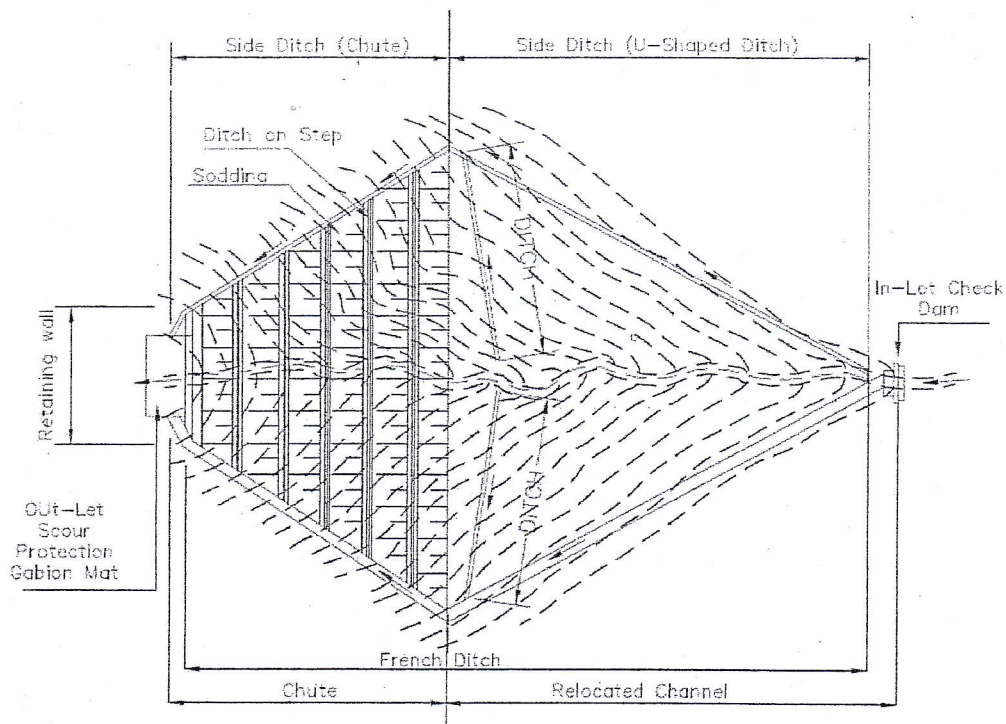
(a): Typical Arrangement for Spoil Banks: Plan
